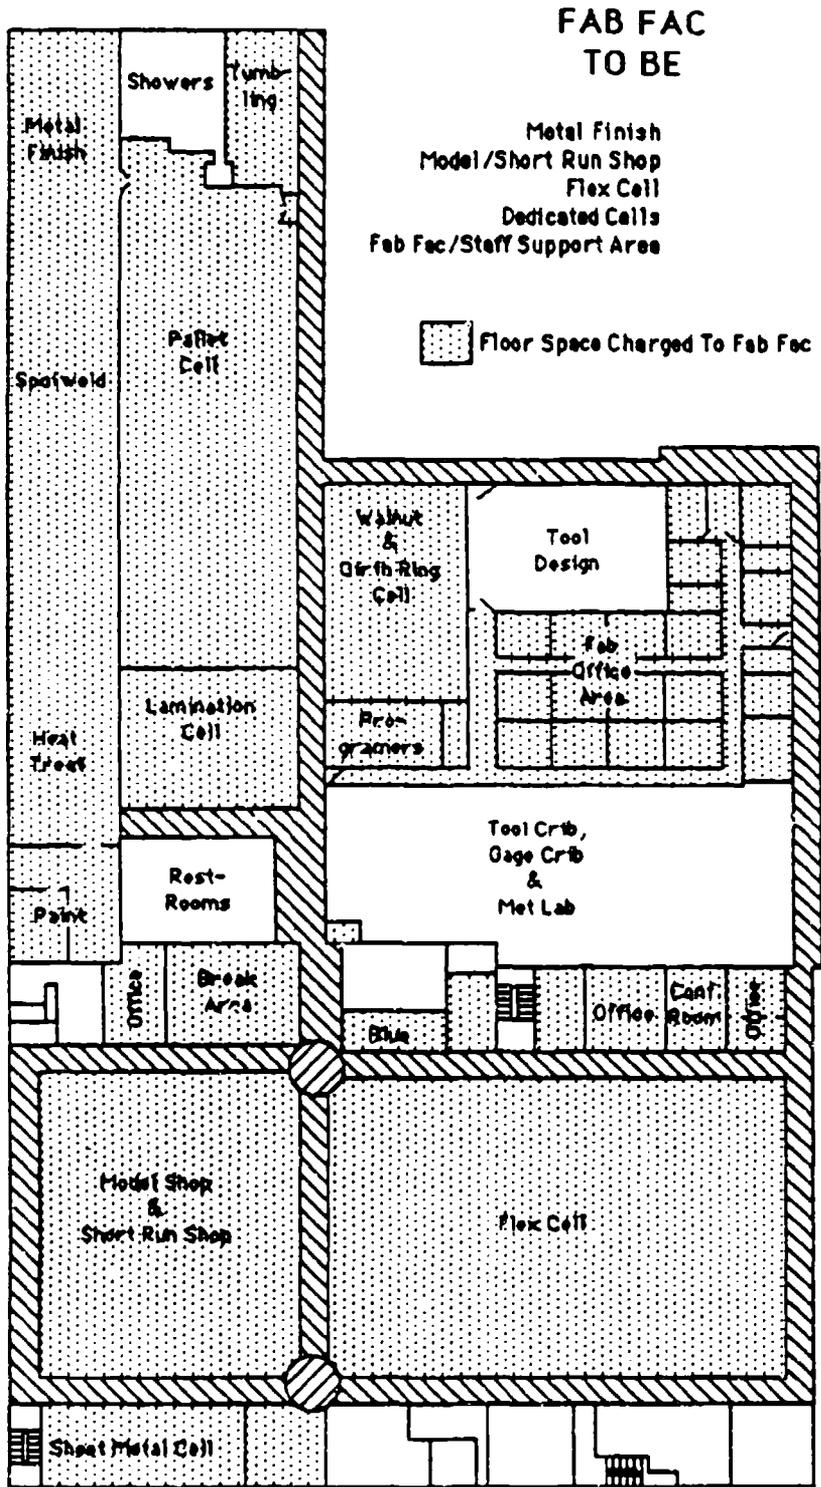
Fabrication Facility Proposed "To-Be" Plan Layout
